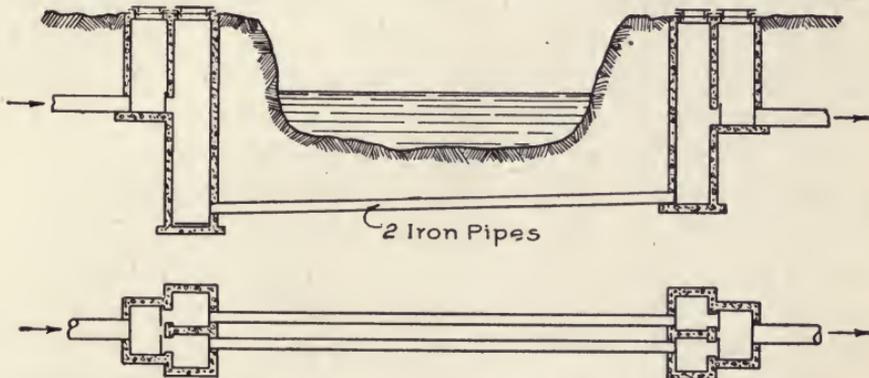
Sectional Elevation and Plan of Inverted Siphon.
